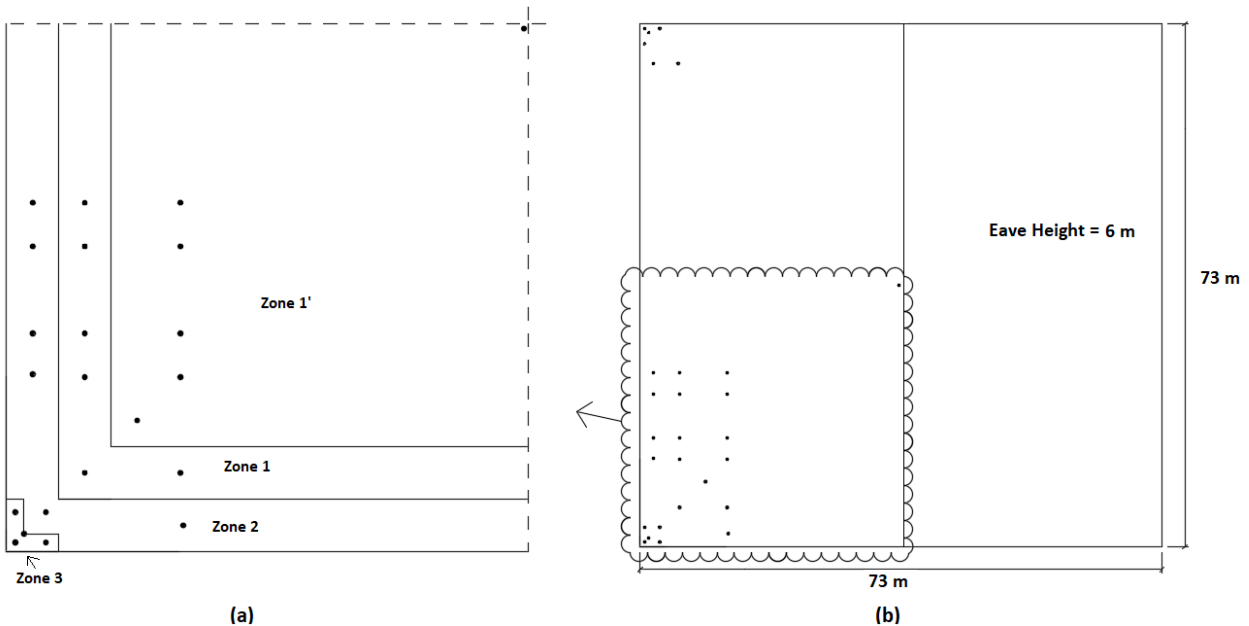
The experimental building of Duro-Last Roofing Inc. (a) Detailed pressure tap assembly, (b) Roof plan dimensions with pressure tap layout.
